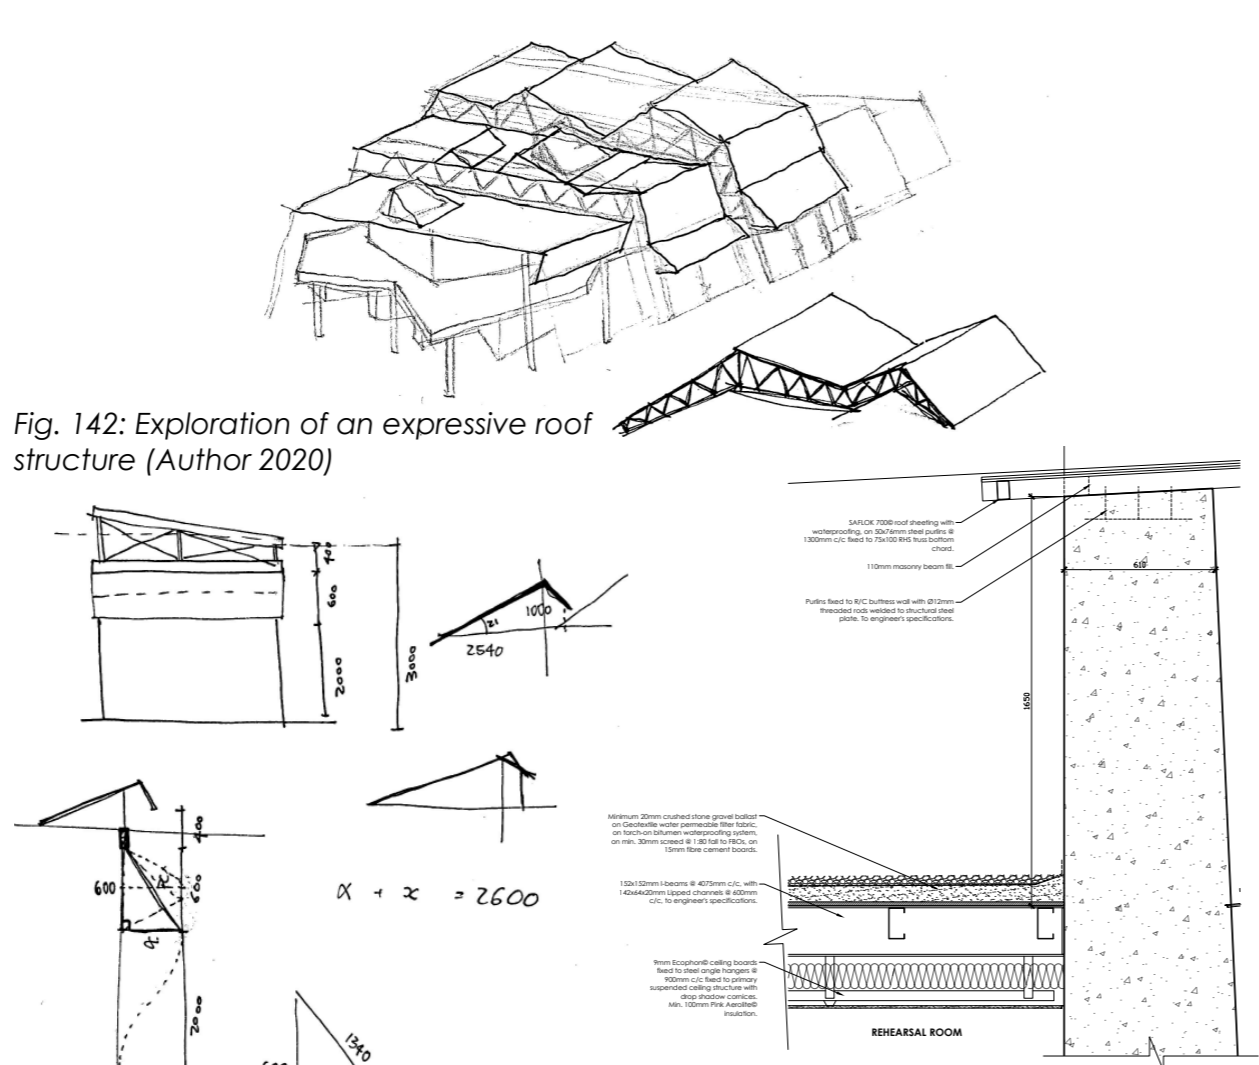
Exploration of an expressive roof structure (Author 2020)
